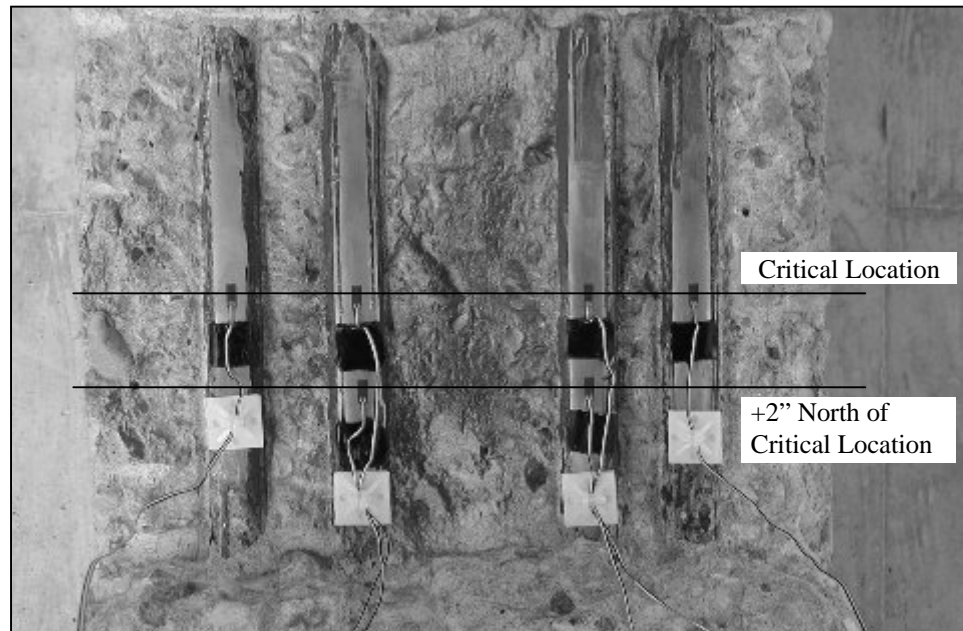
Typical Strain Gauge Installation to Steel Reinforcement
